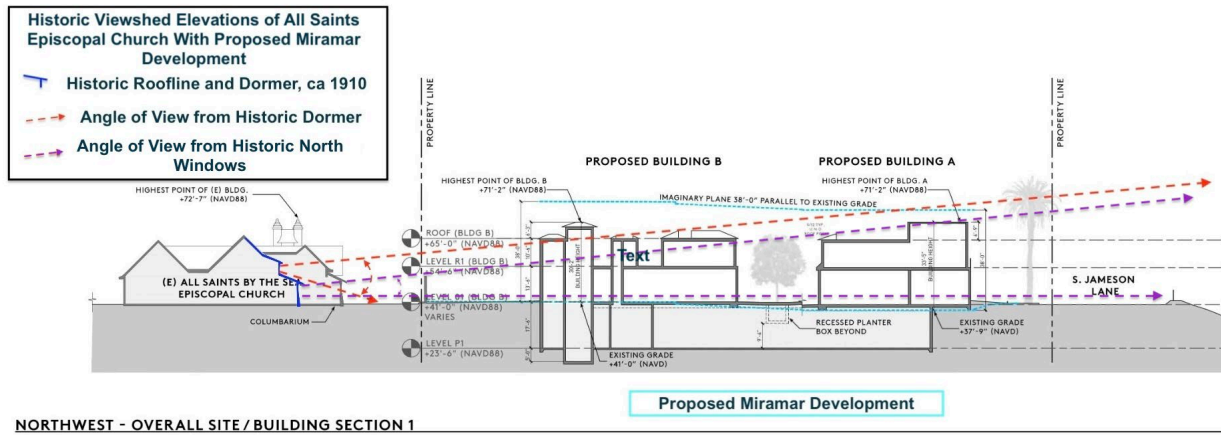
Illustrated historic viewshed superimposed on proposed Project elevations
